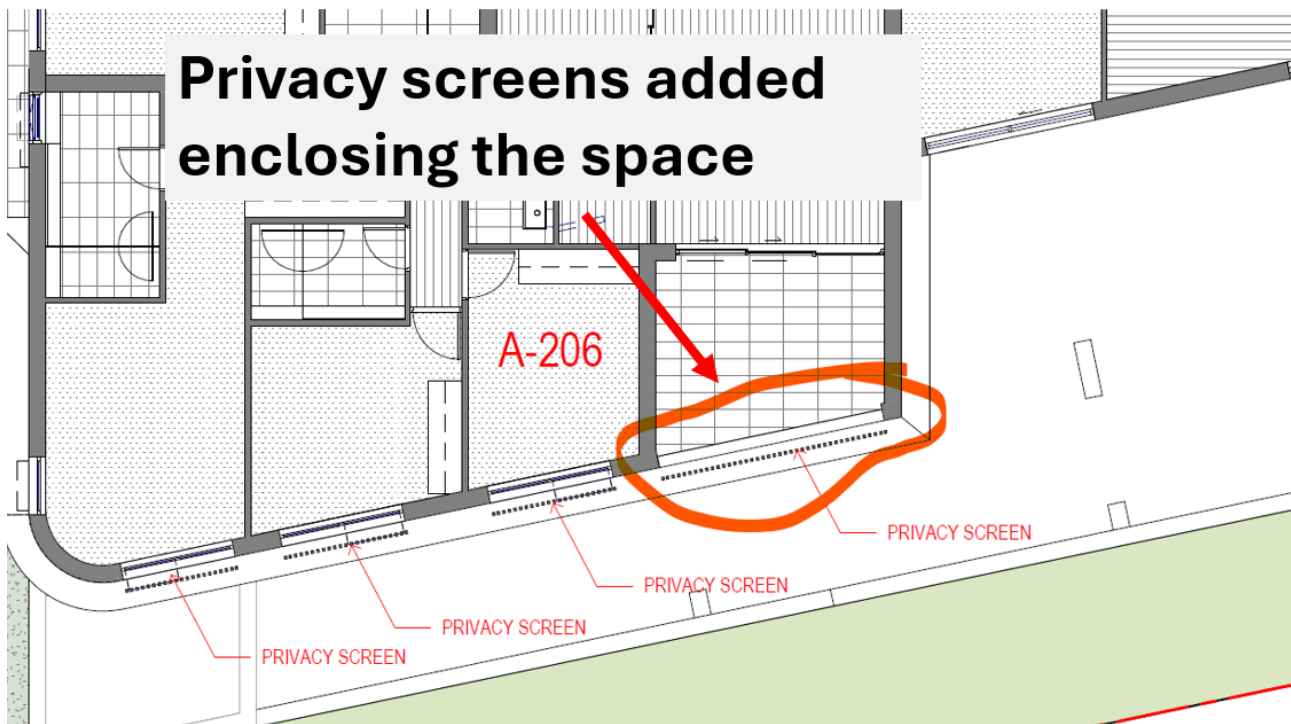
Screening for balconies indicated in red (Source: Updated Architectural Plans – DA 9109)
